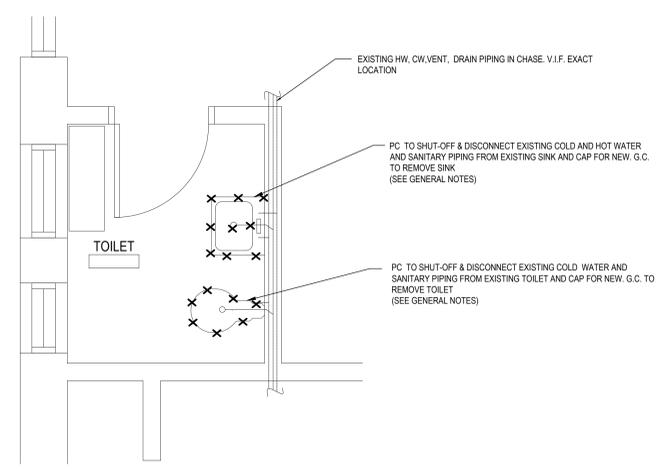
DETAIL "A" - PLUMBING DEMOLITION 1ST FLOOR TOILETS PLAN
